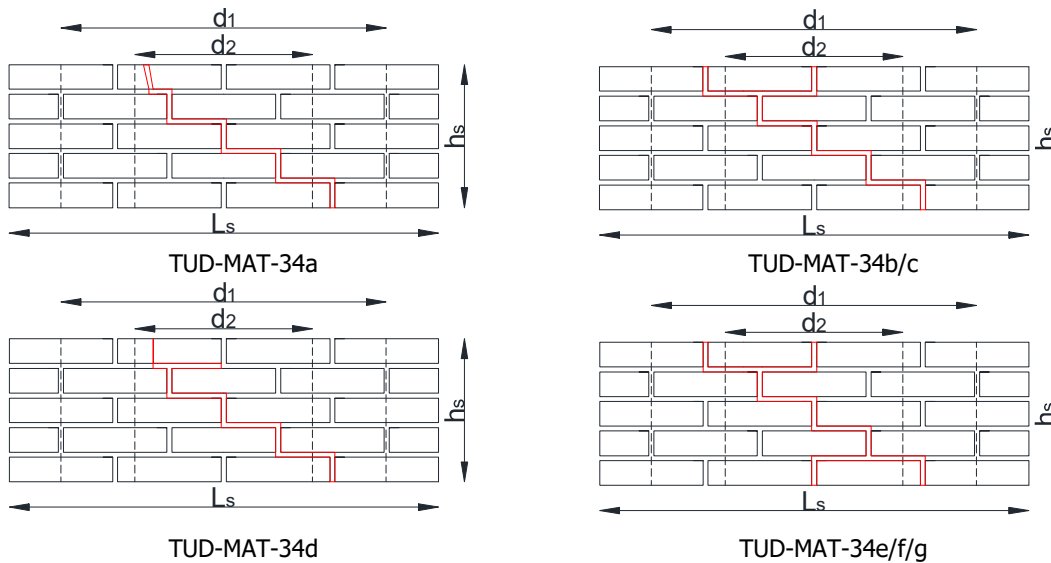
Crack pattern for single wythe masonry specimens subjected to in-plane bending (IP).
